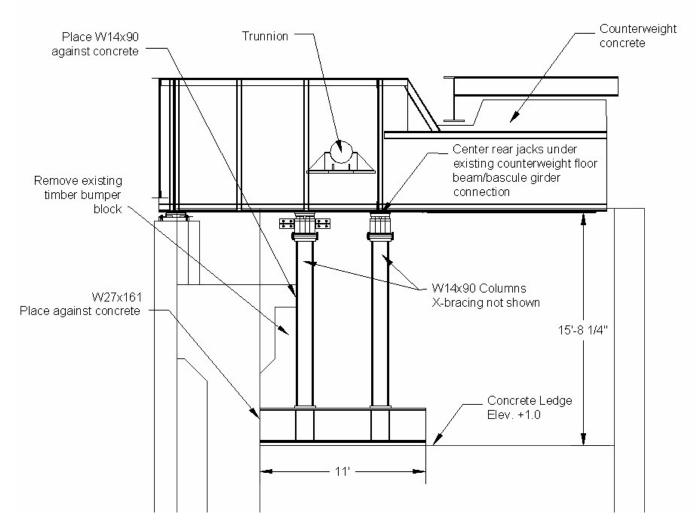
Elevation view of jacking system. Note transverse beam directly above counterweight
